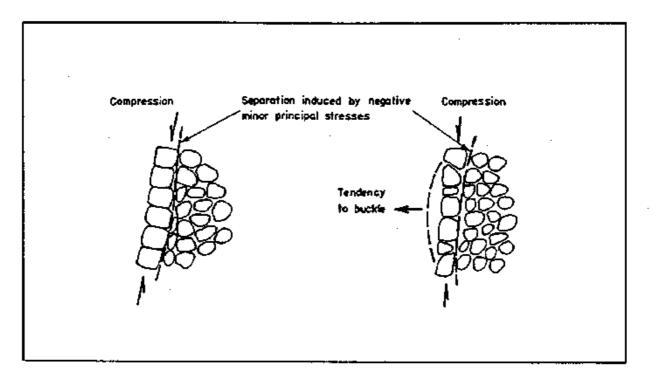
Effect of Block Shapes on Buckling of the Face Layer of Stone Rubble Blocks in Masonry Retaining Wall
